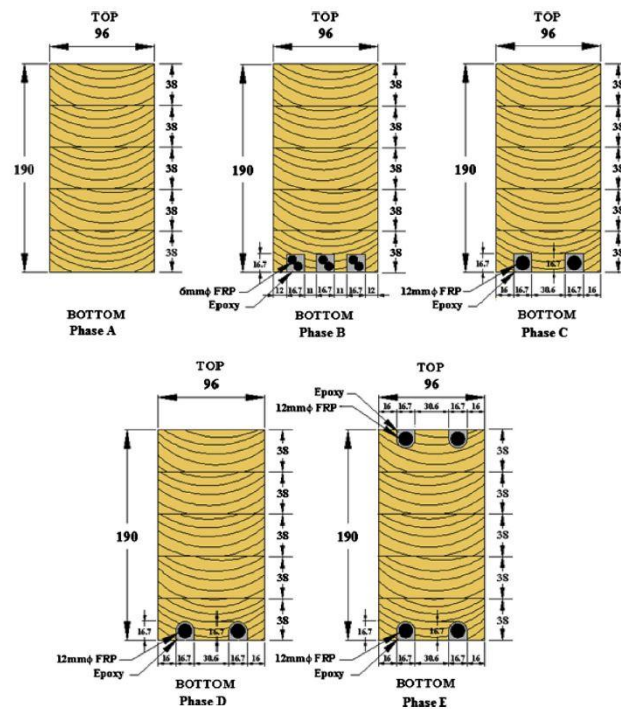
Arrangements of GFRP rod reinforcement in Raftery and Whelan (2014).
